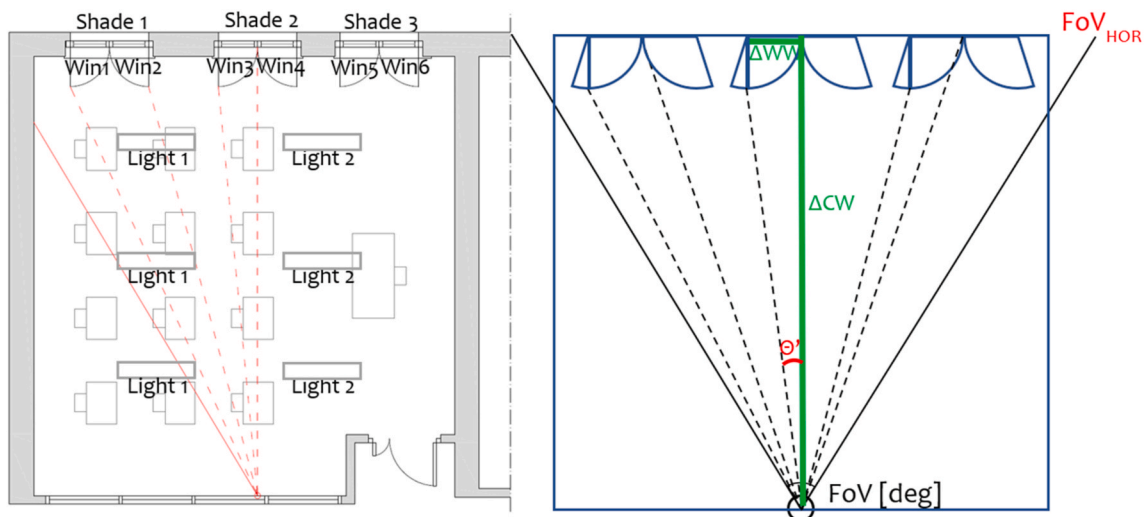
Floorplan of classroom chosen for case study and nomenclature windows & parameters.
